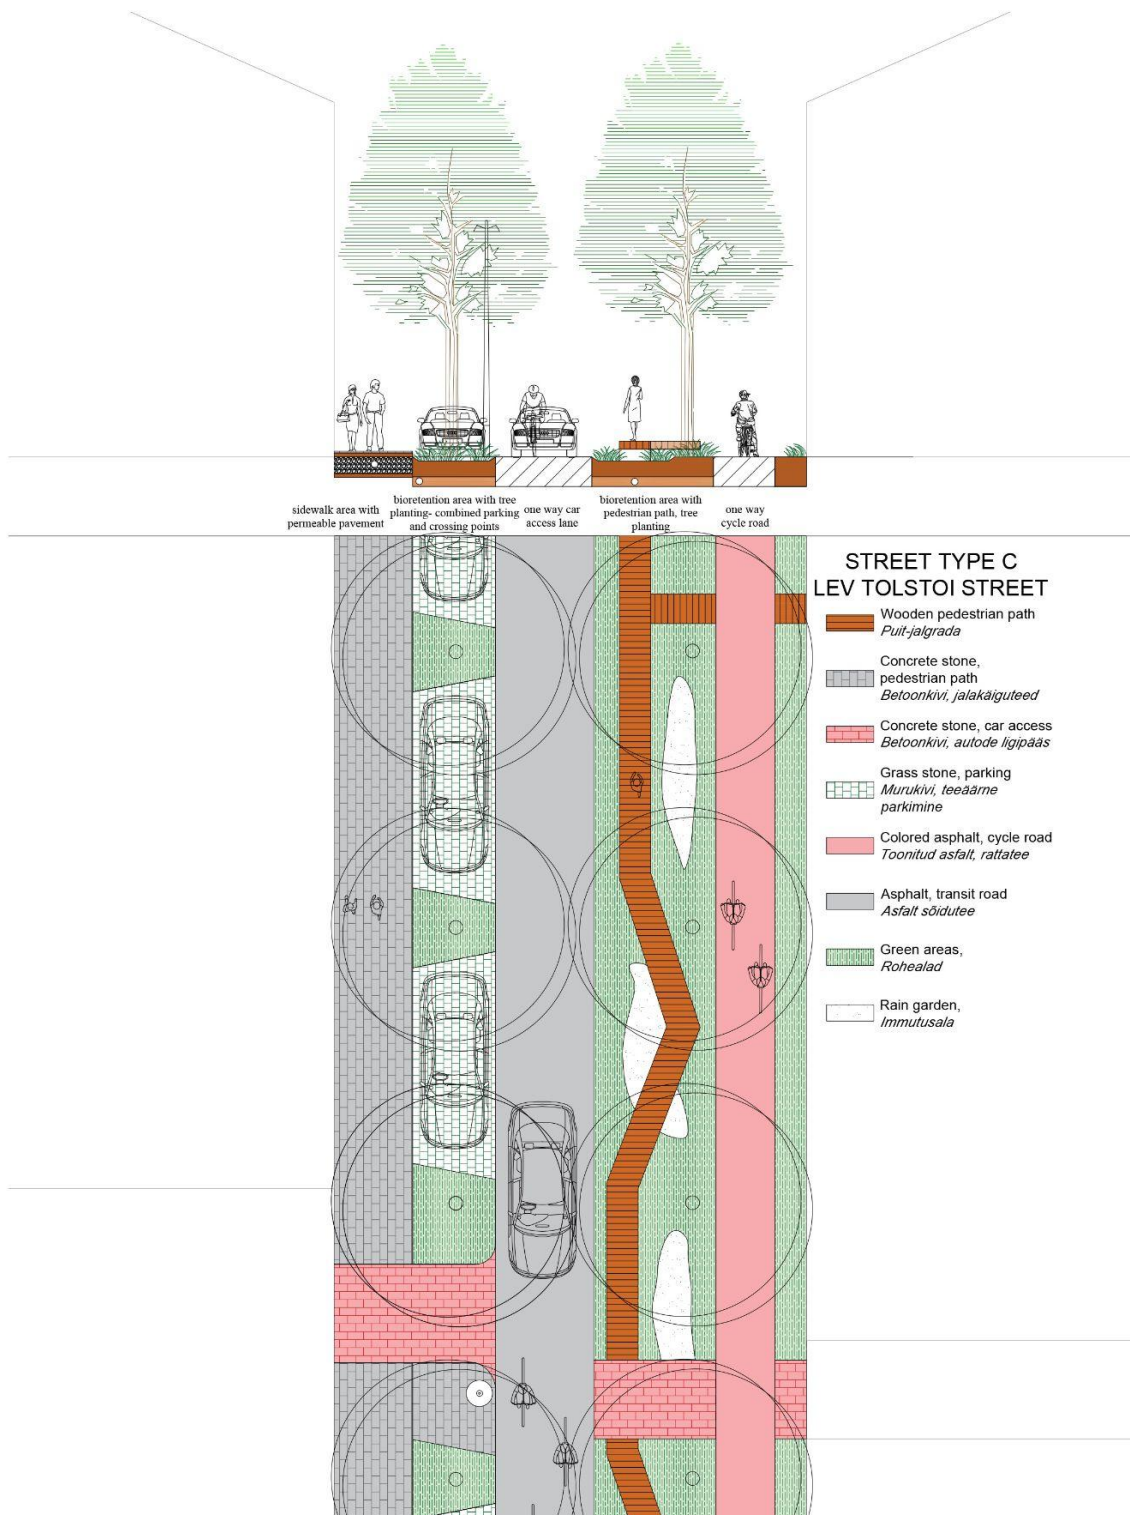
Conceptual section and plan segment of street type C (Author, 2021).
